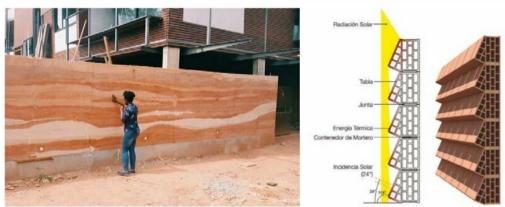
Rammed Earth WallFigure 9: Mud bricks of various forms for wall construction
